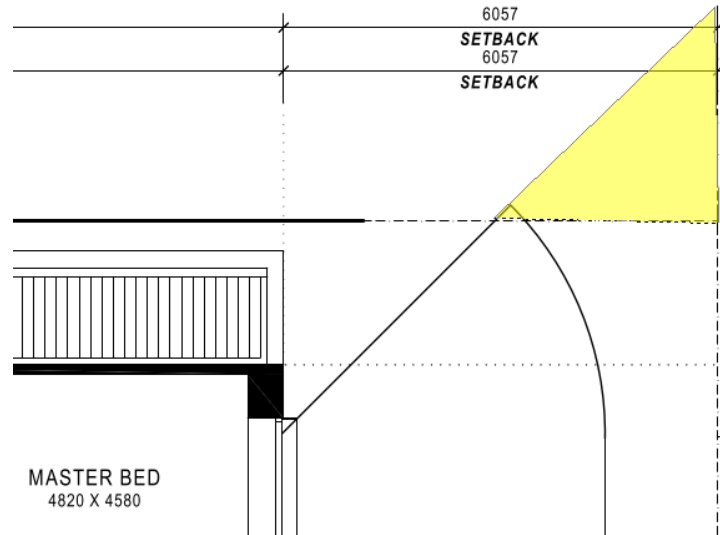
Overlooking from upper floor master bed on south-western elevation toward No. 24 Banksia Terrace.
